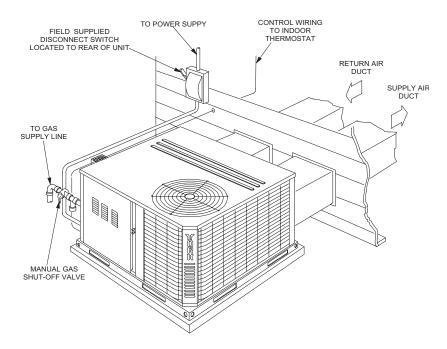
TYPICAL SLAB ON GROUND INSTALLATION
